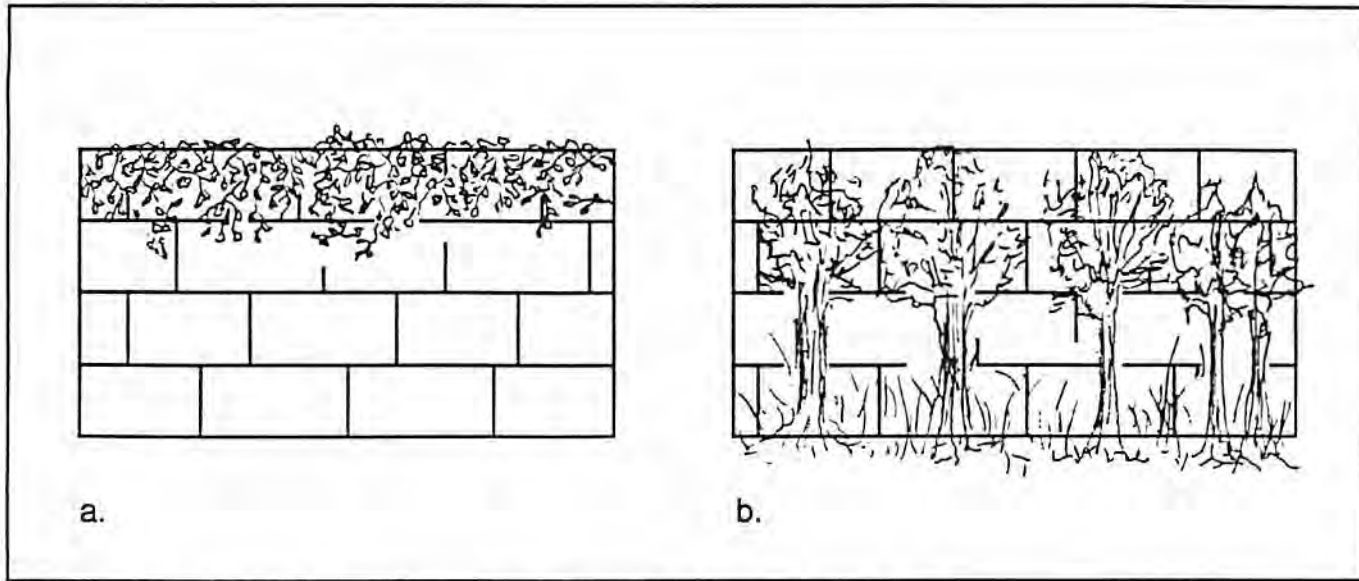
a. Concrete Wall with Hanging Plants. b. Concrete Wall with Plant Layer in front of Barrier.
